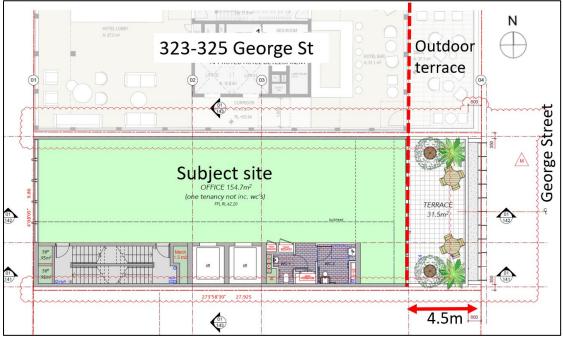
Level 13 floor plan of the proposed development and the approved hotel development of
